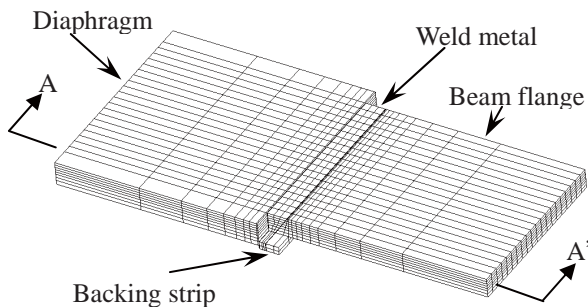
Analysis model at the butt weld zone between the diaphragm and the beam flange
